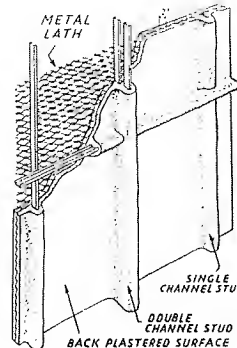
Vertical and Horizontal Ribs Reinforce Wall.
